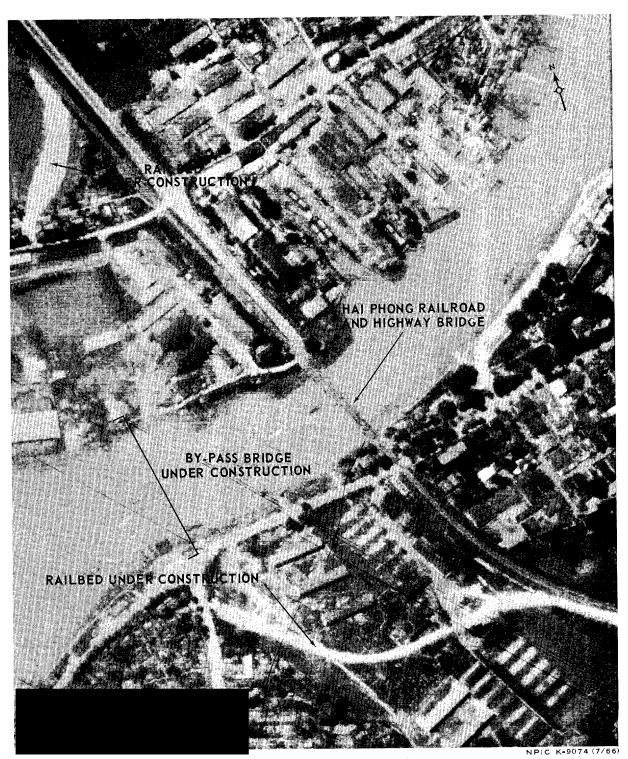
RAILROAD BY-PASS BRIDGE UNDER CONSTRUCTION, HA NOI/HAI PHONG RAIL LINE, NORTH VIETNAM
